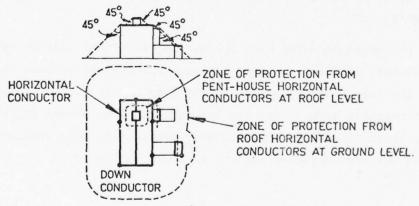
Detail of air terminations, downleads and earthing system for lighting protection of a building. Adapted from Fig. 5 of [7].
